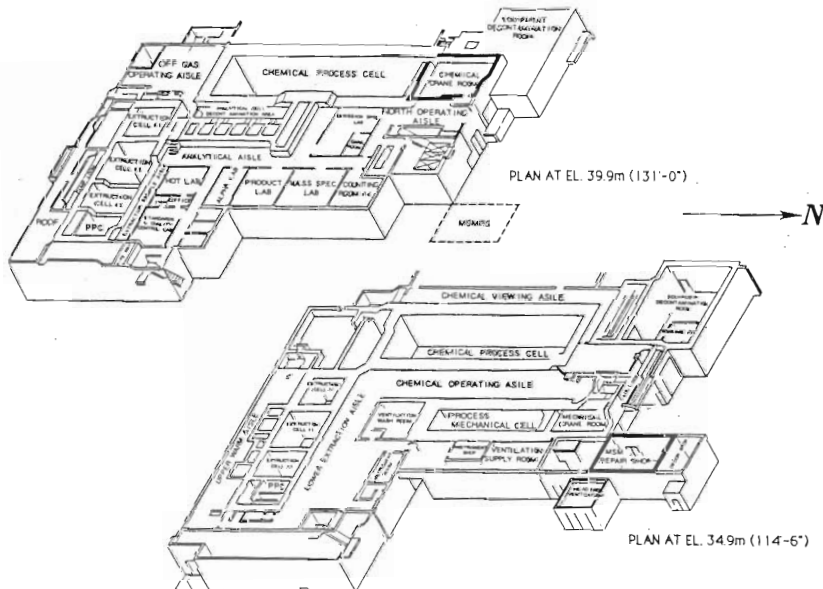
Process Building Internal Layout at Elevations 131 feet 0 inches and 114 feet 6 inches
